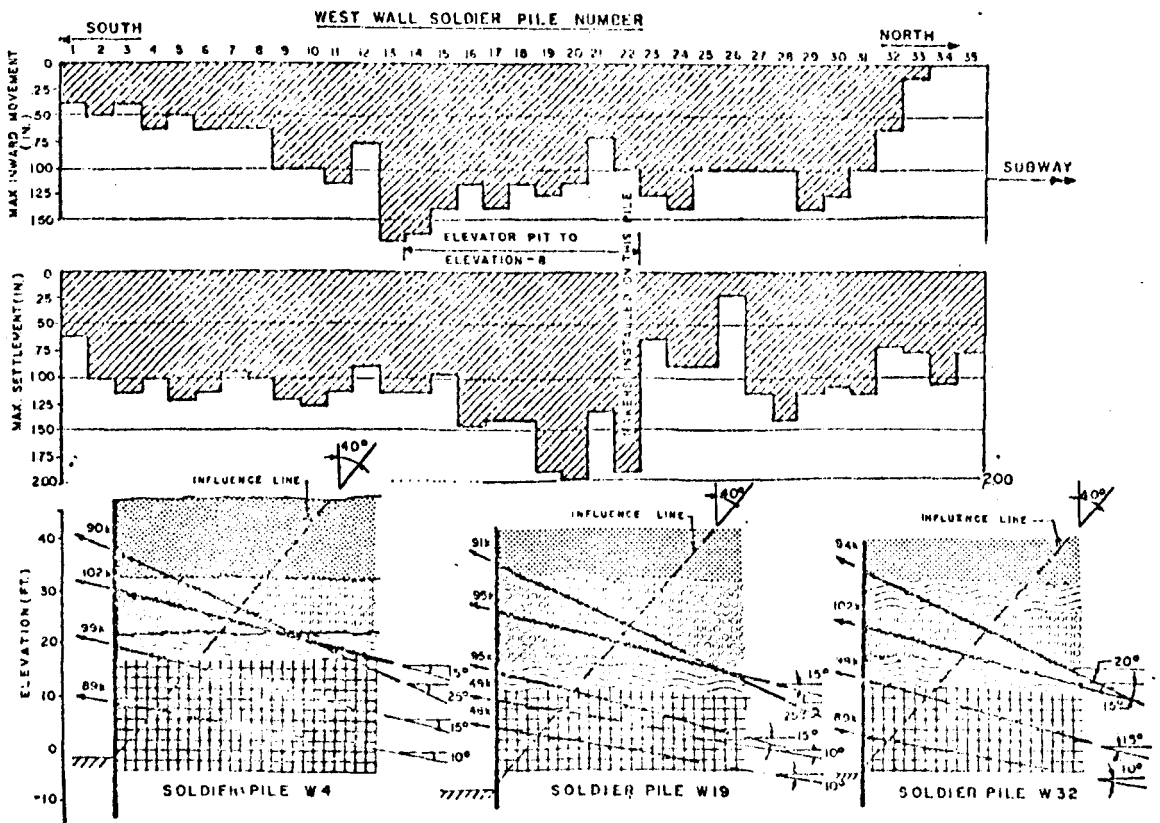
PILE MOVEMENT AND TIEBACK LOCATION-WEST WALL
